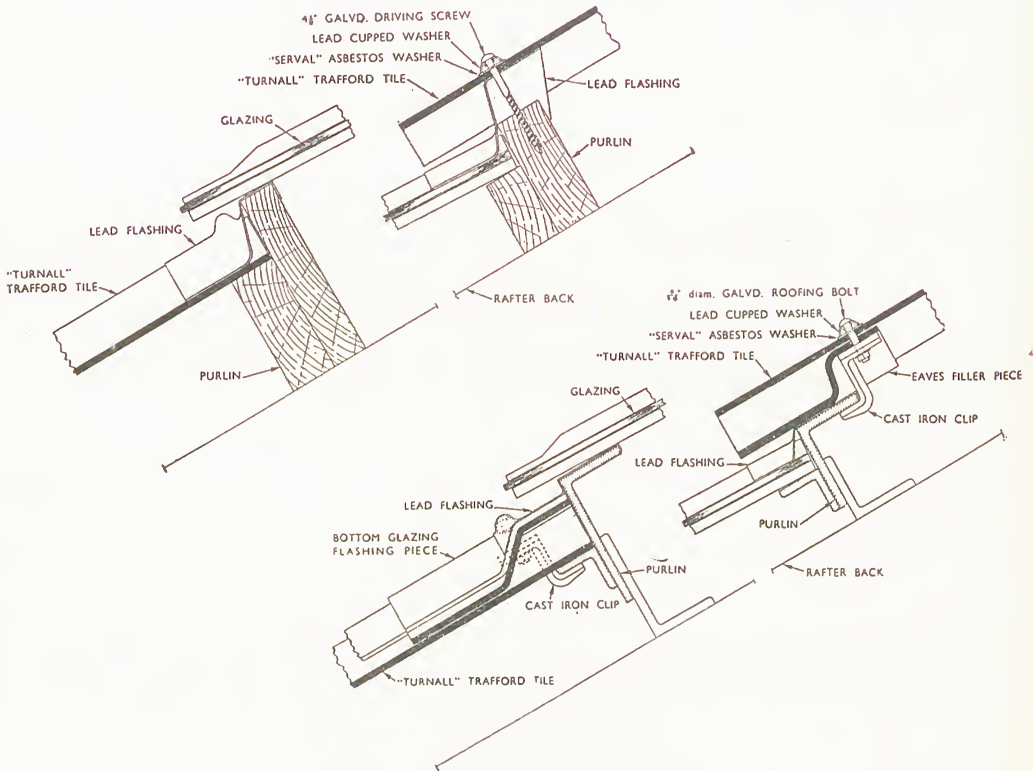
Roof glazing : (top) wood purlins ; (bottom) steel purlins.
